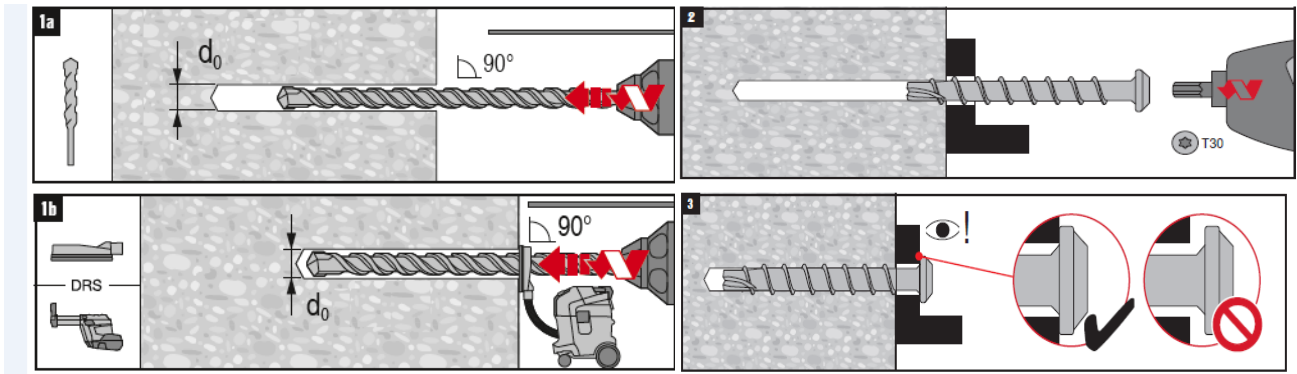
C—INSTALLATION INSTRUCTIONS – HILTI KH-EZ P, PM, PL SCREW ANCHORS
